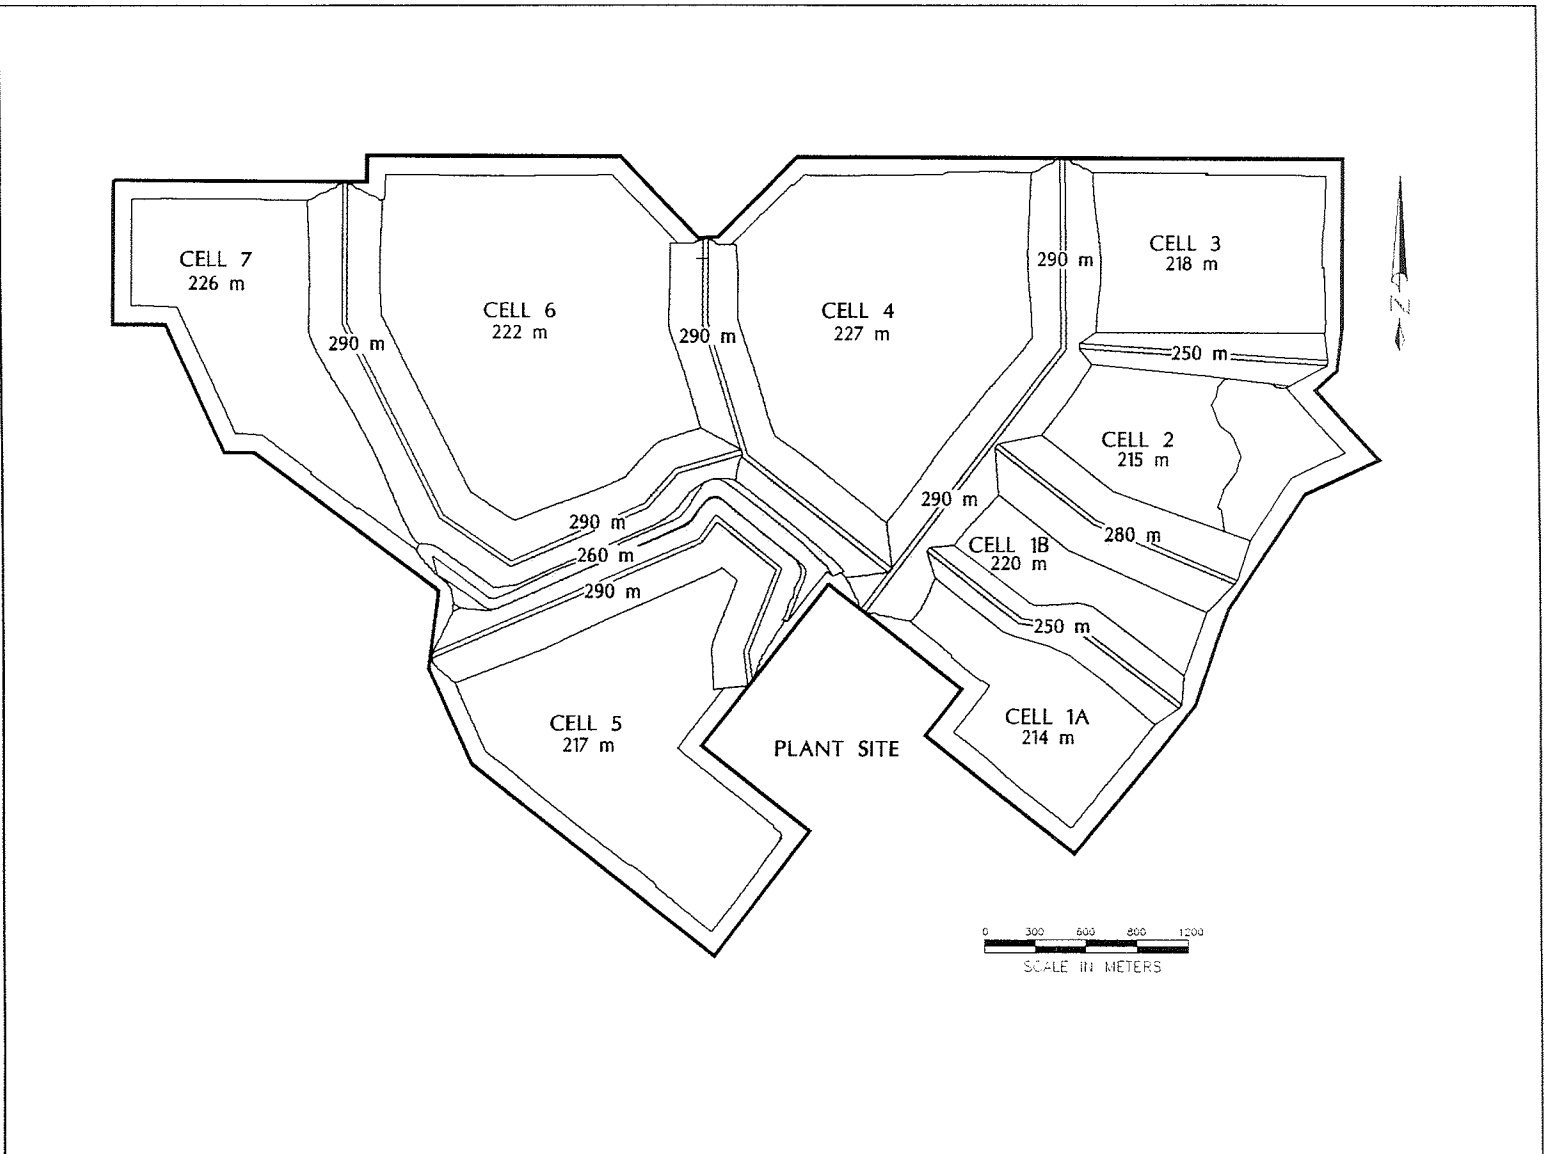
Site Plan Showing Proposed In-Pit Dykes
